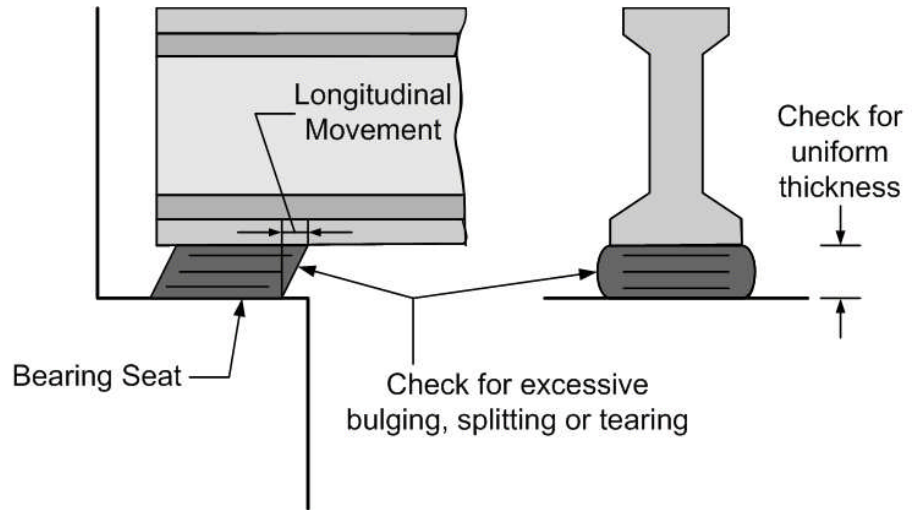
Elastomeric Bearing Inspection Checklist Items
